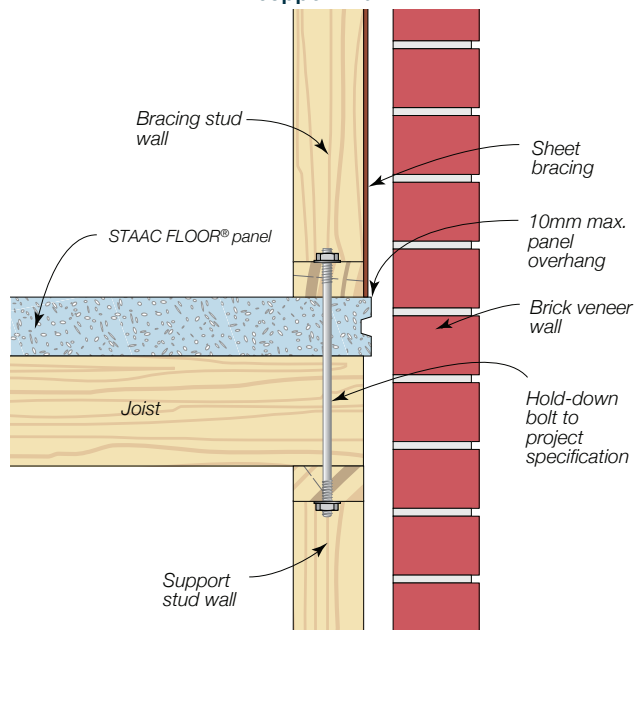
Hold-down of External Bracing Wall Over Bearer
